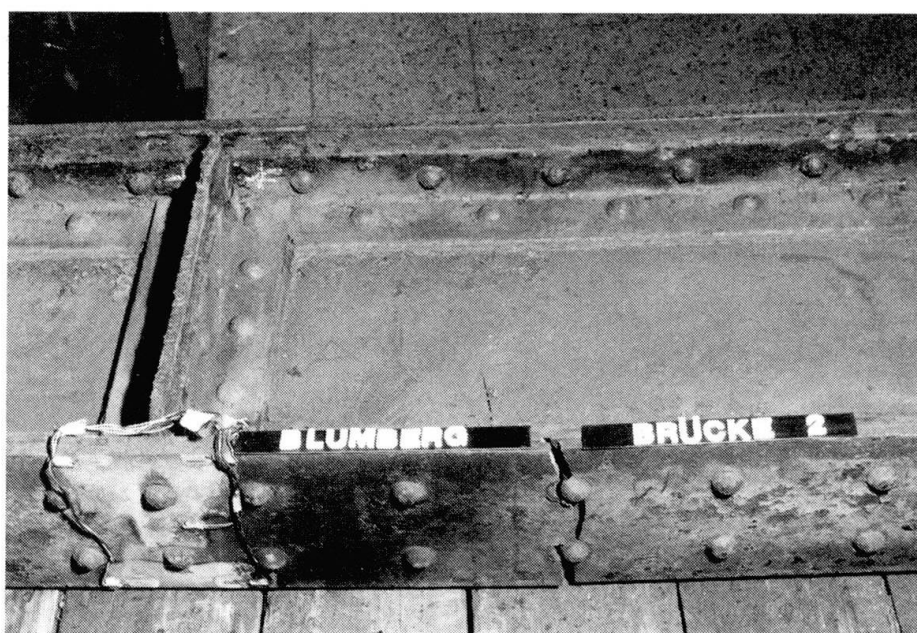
Failure mode for the longitudinal girder of the Blumberg bridge
